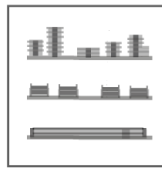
Layout of groundfloor consisting of collective spaces (red) completely.
